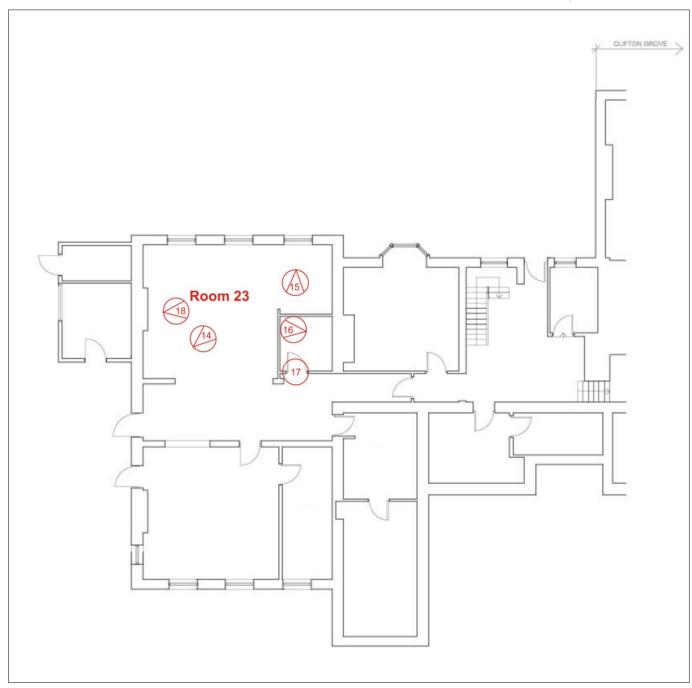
Basement photo location plan (Base Plan © 105 West Architects Ltd)
